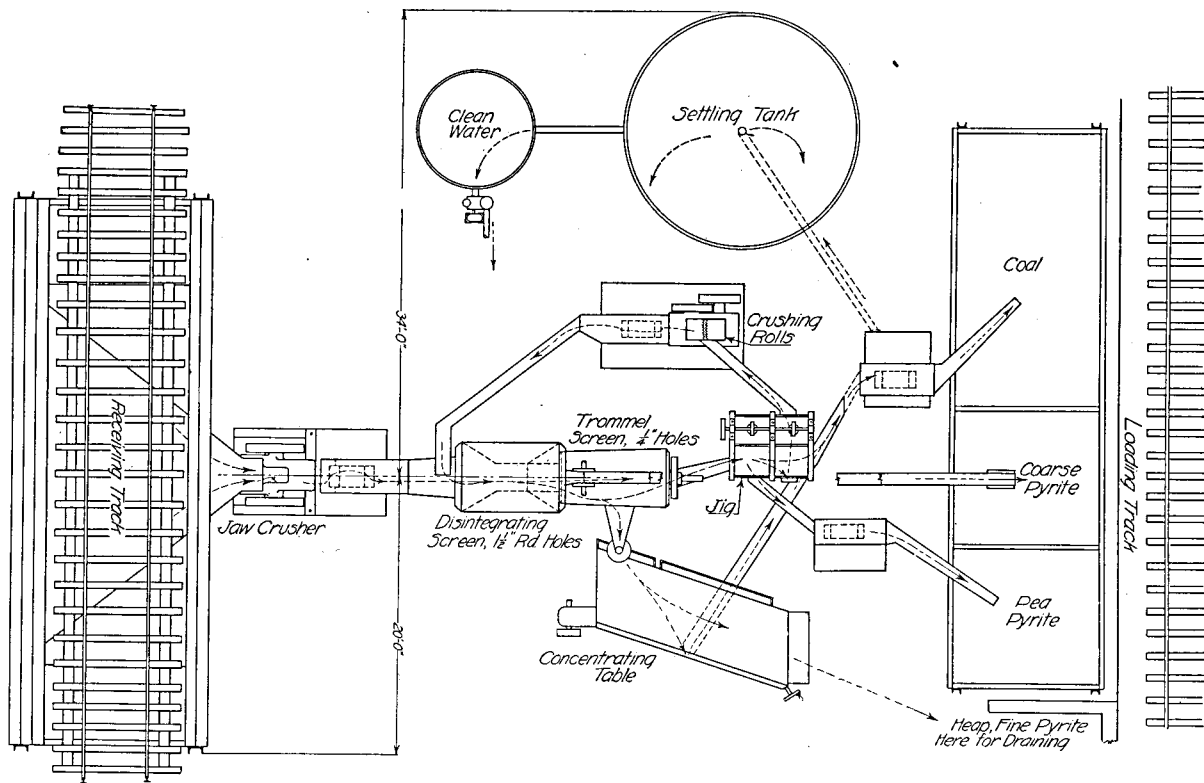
PLAN OF PROPOSED PYRITE WASHING PLANT
